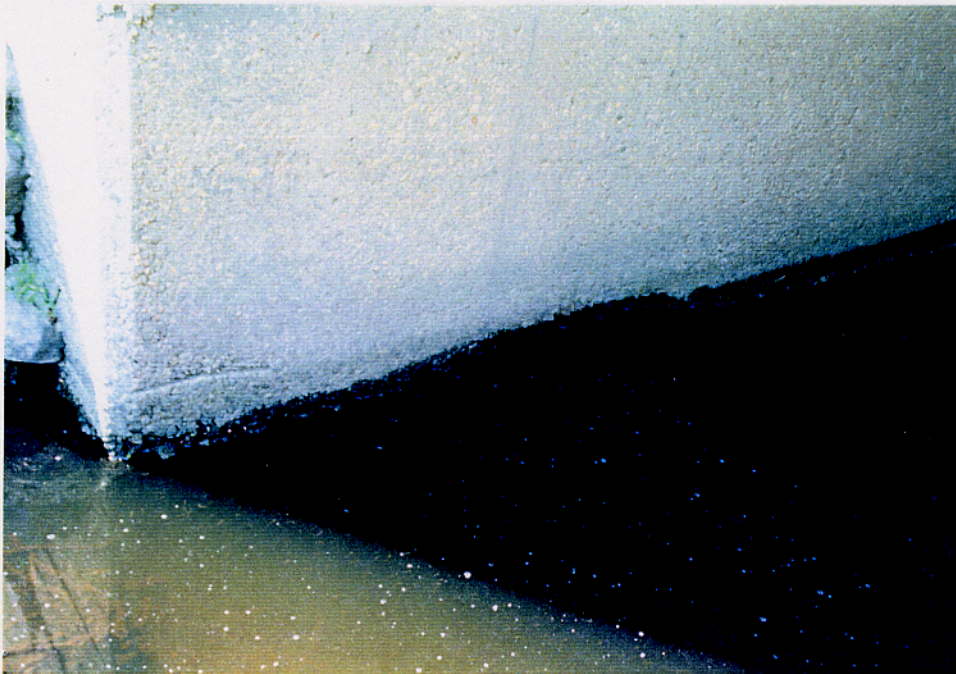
Choate Brook Bridge, Downstream End of the Right Abutment
